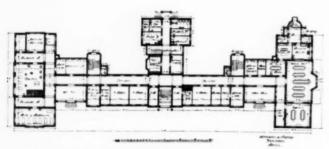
Pavilion for female tuberculosis patients-Floor plan.
